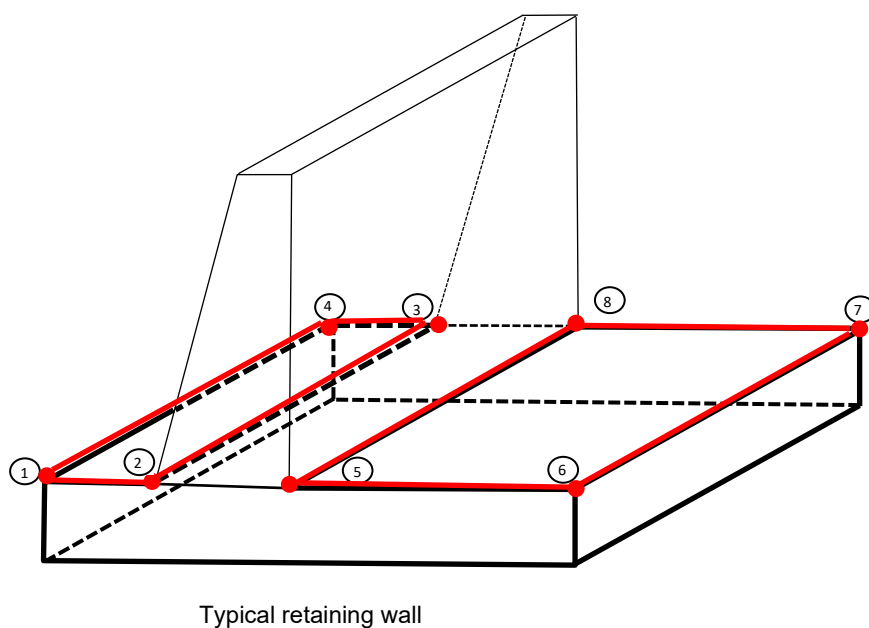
(a) – As Constructed Survey of excavated area of retaining wall footing
